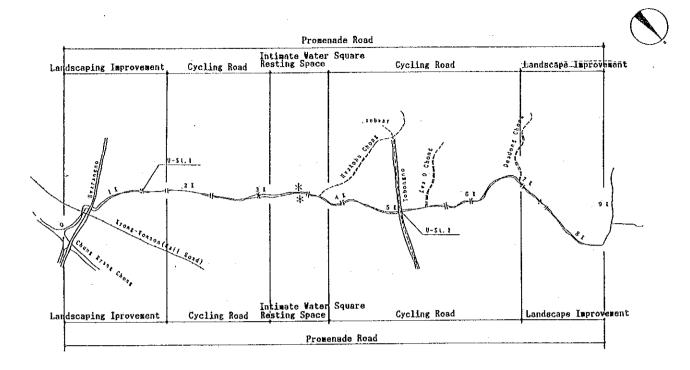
E Proposed Facility Plan of Ui Chong
